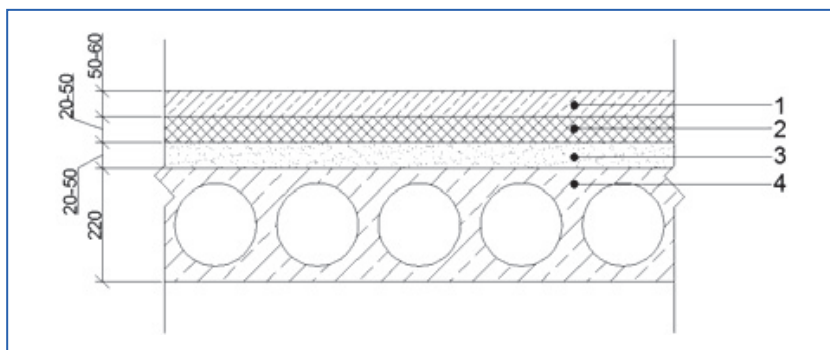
Floor construction "II-type". 1) sand/cement screed, 2) mineral wool, 3) expanded clay, 4) reinforced hollow concrete slab.
